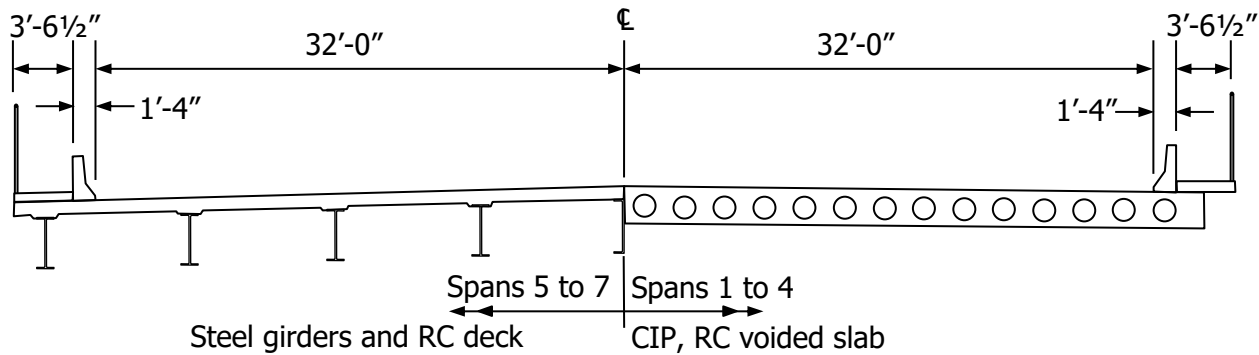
Typical cross-sections and dimensions for Bridge Number 15558X.
